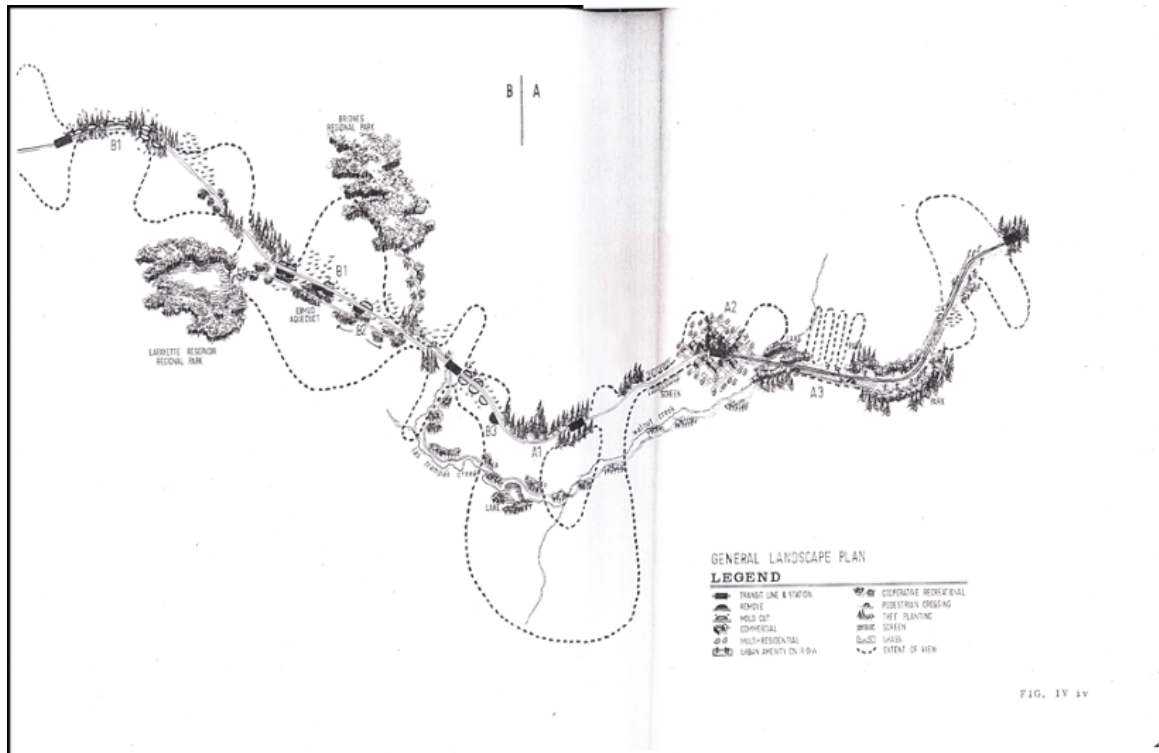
, BART General Landscape Plan between Orinda and Concord
